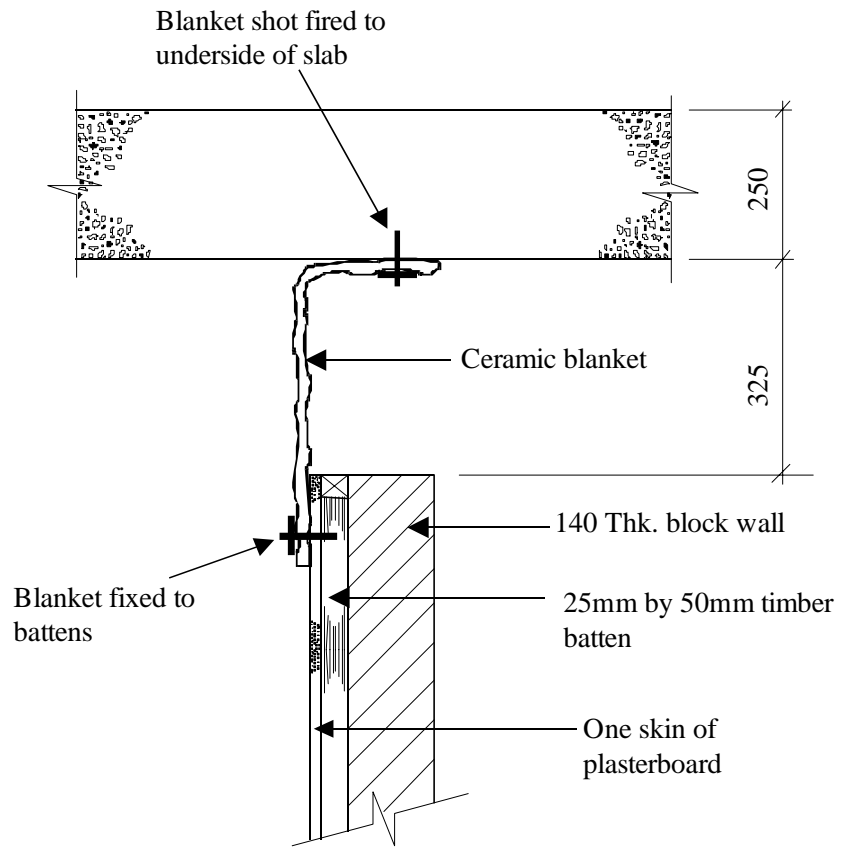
Detail showing fixing of ceramic blanket to first floor soffit and compartment wall.
